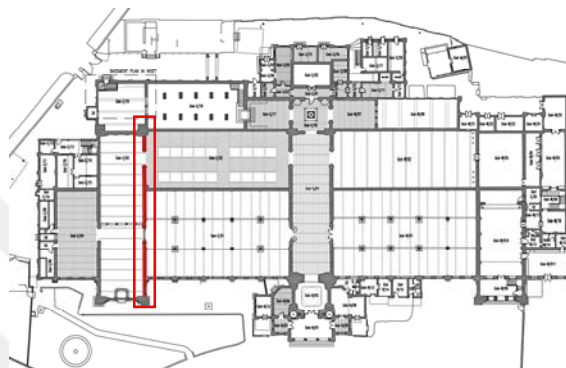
Key Plan showing wall Gnd-E/03-W-W
